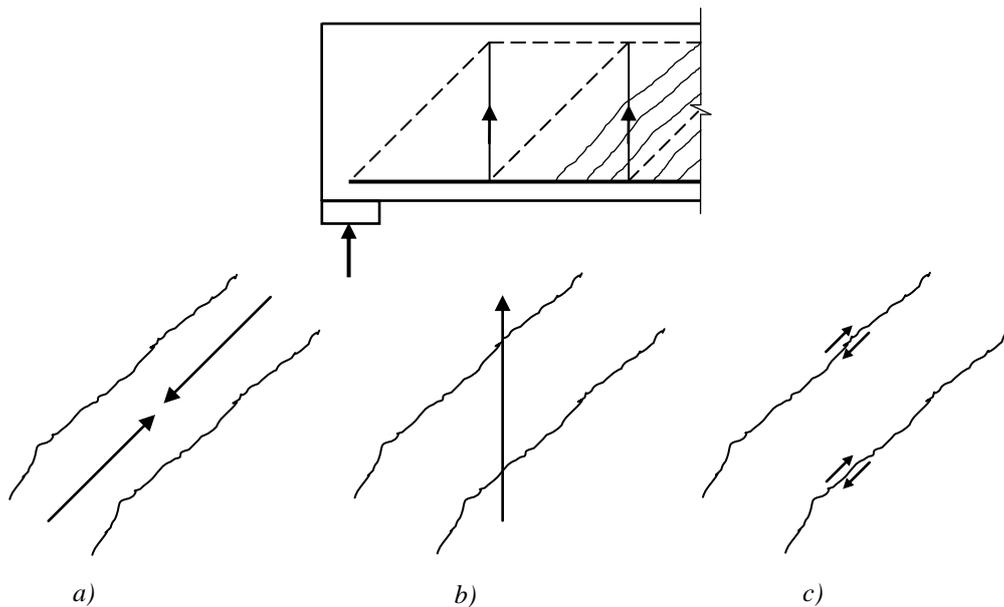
Load path to the supports after cracking, a) compression is resisted by concrete between cracks, b) forces are lifted over the cracks by reinforcement or c) by friction and interlocking effects.
